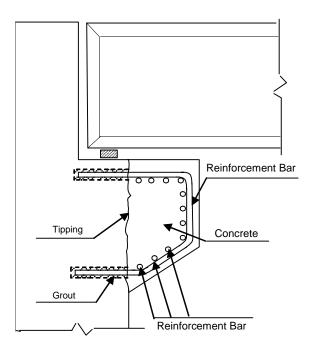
Sample of Unseating Concrete Bracket
